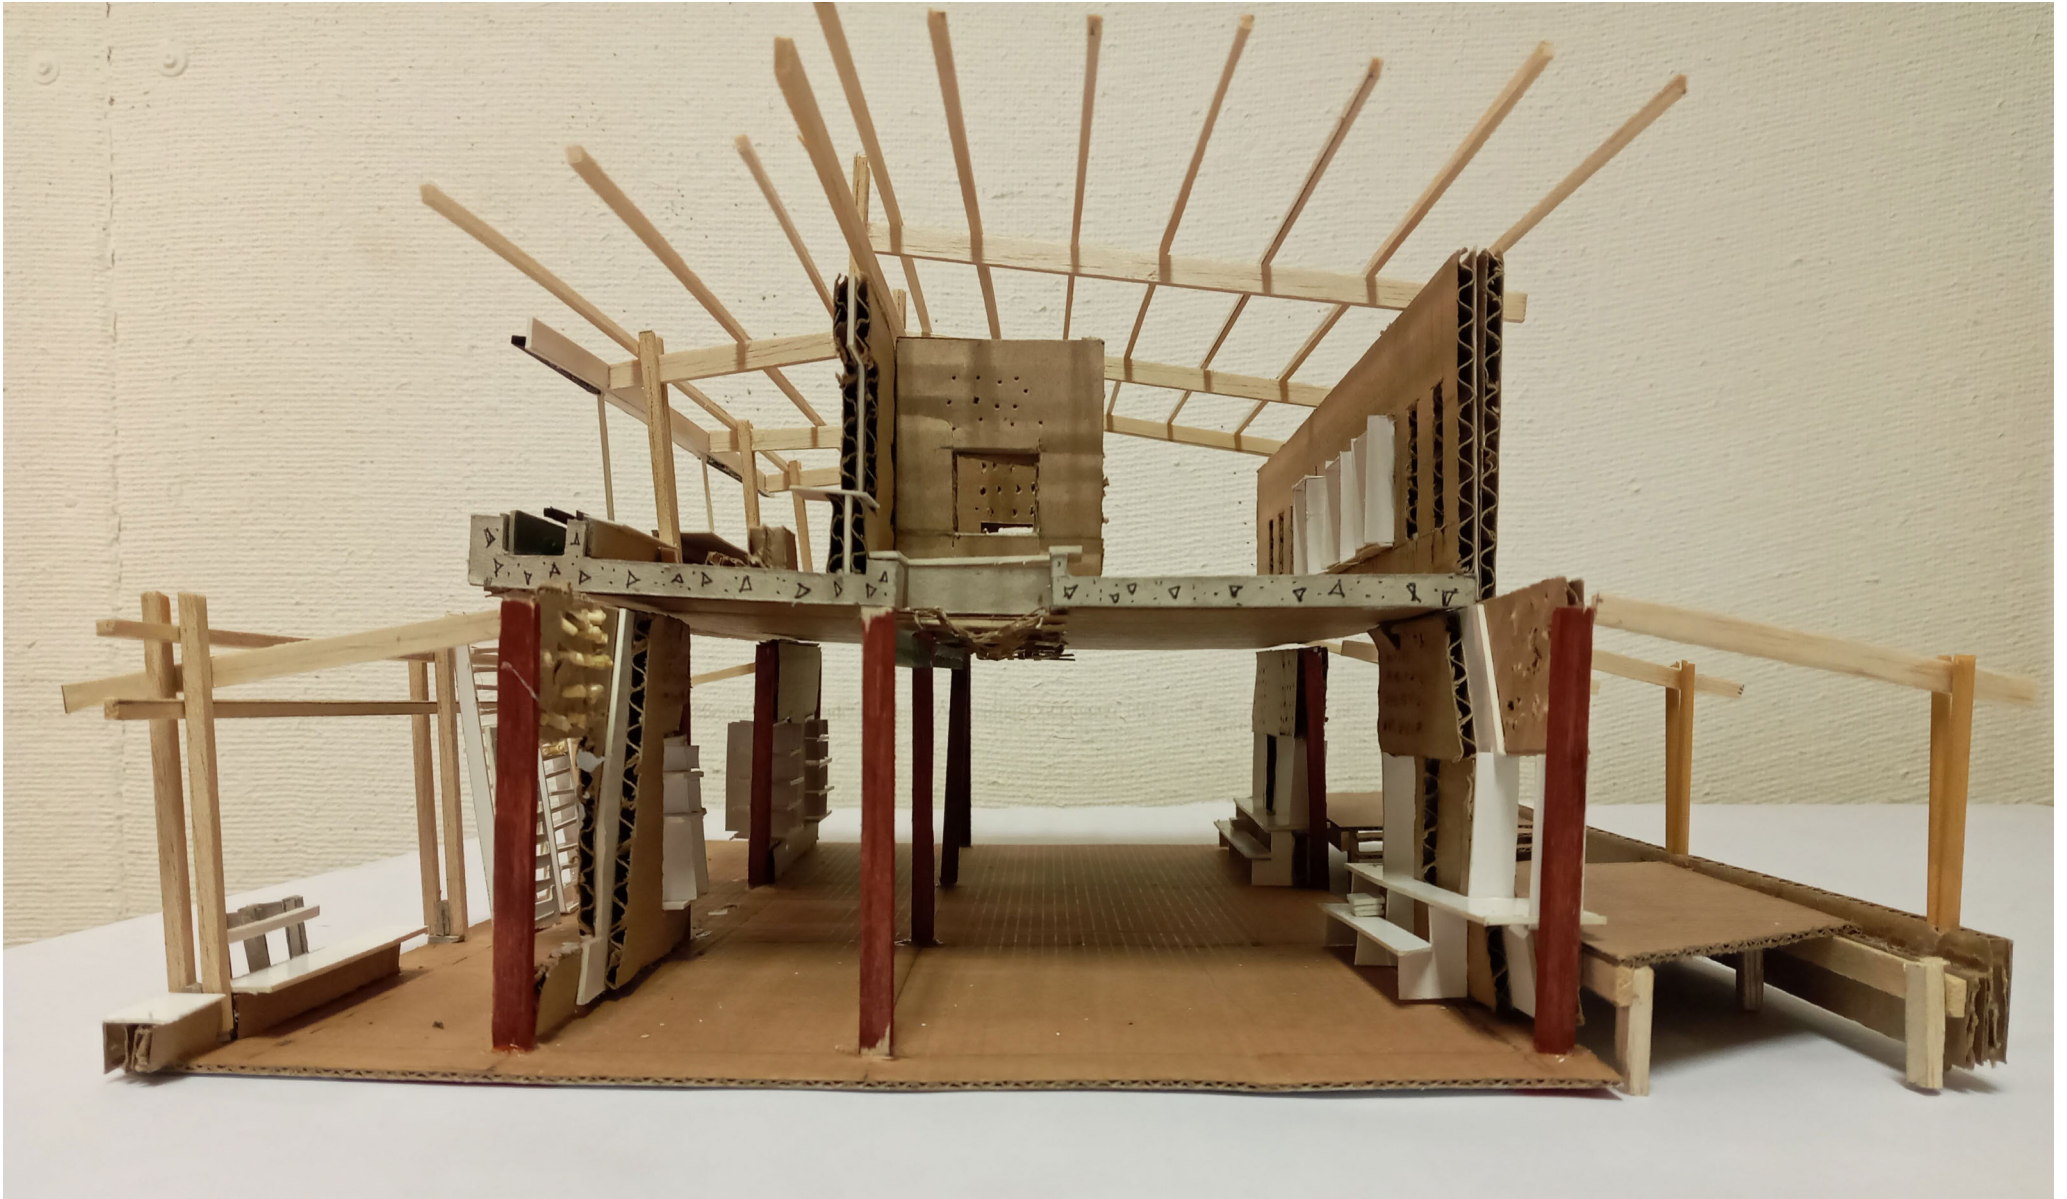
1:50 section model through afterschool centre (Author 2021).
